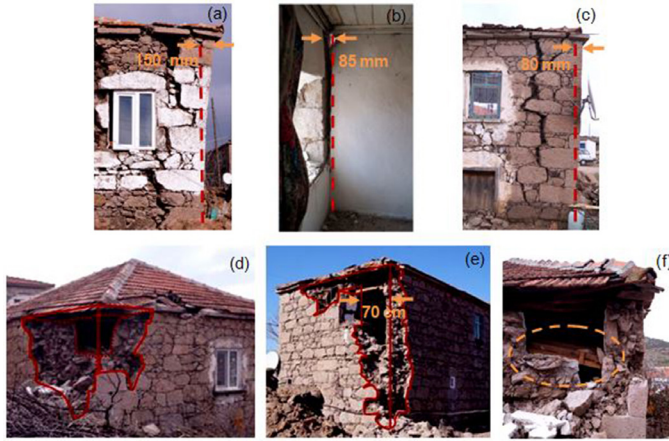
Vertical displacement of load-bearing external walls (a, b, c) and partial collapse in corner sections (d, e, f).
